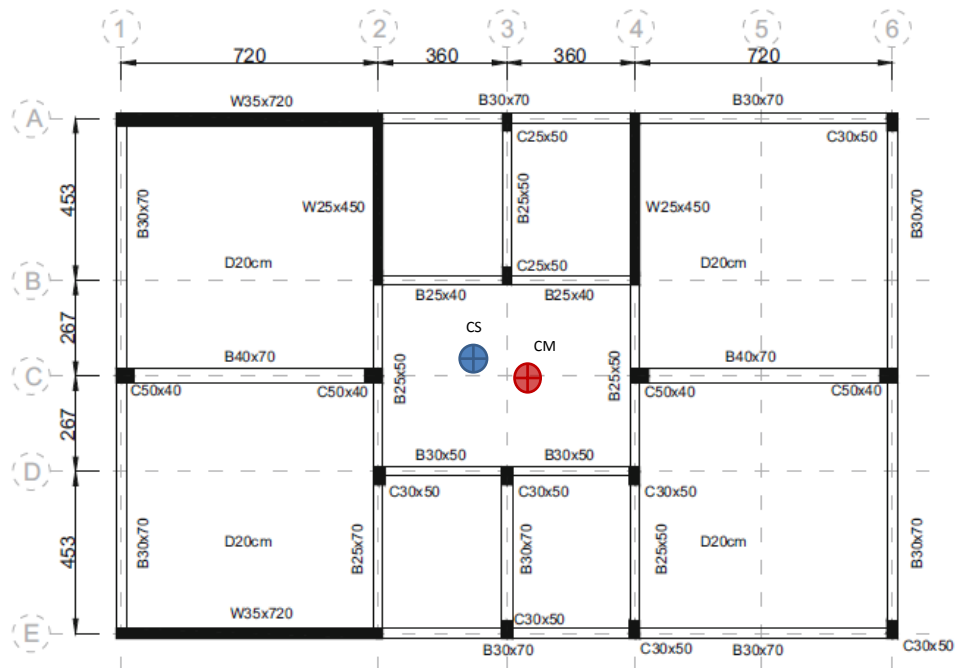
Plan of Gedikbulak building (Bal and Symrou, 2016)
